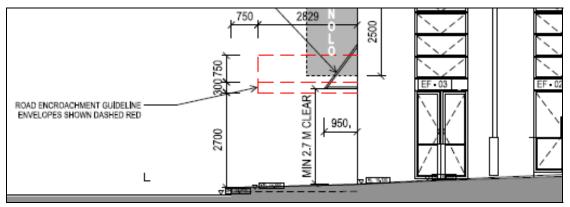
Proposed weather canopy (Lonsdale Street elevation)
